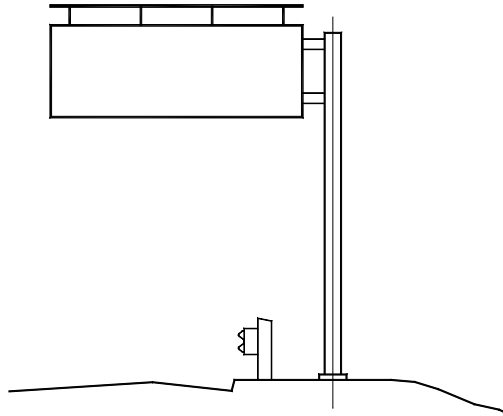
(a) SINGLE CANTILEVER SIGN SUPPORT
